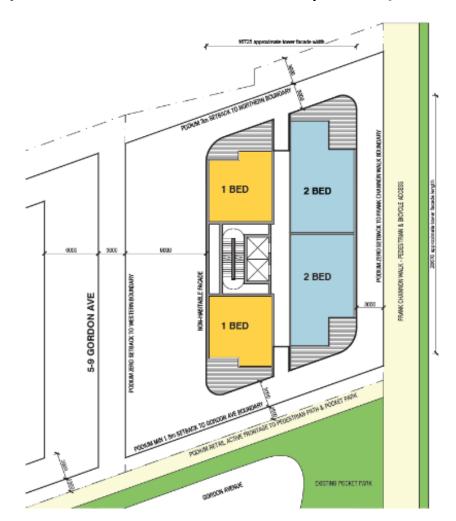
Indicative Tower Floor Plate for Redevelopment of 1-3 Gordon Avenue
